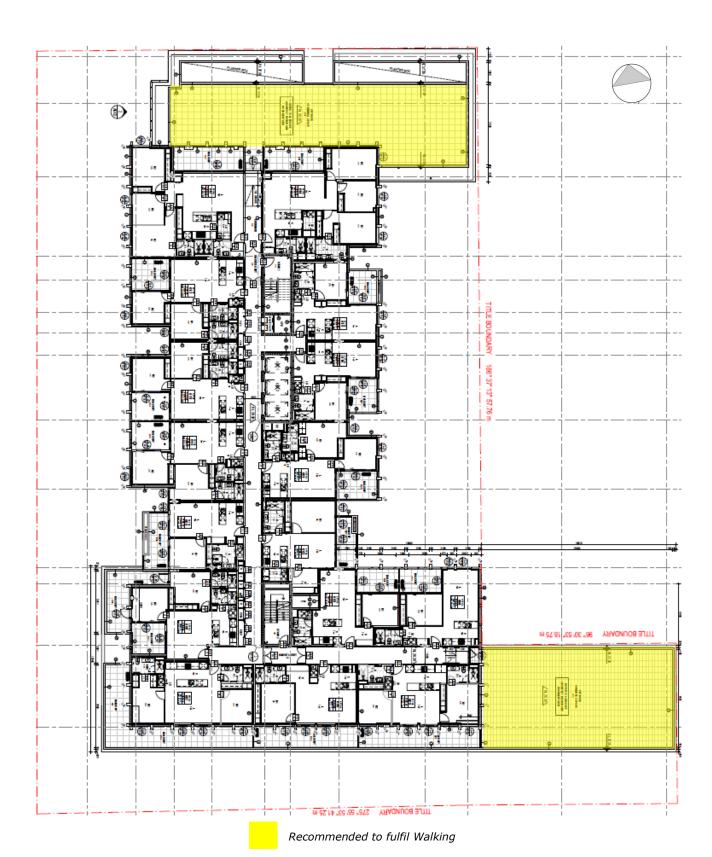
Level 6 floor plan with the recommended wind criteria overlaid.
